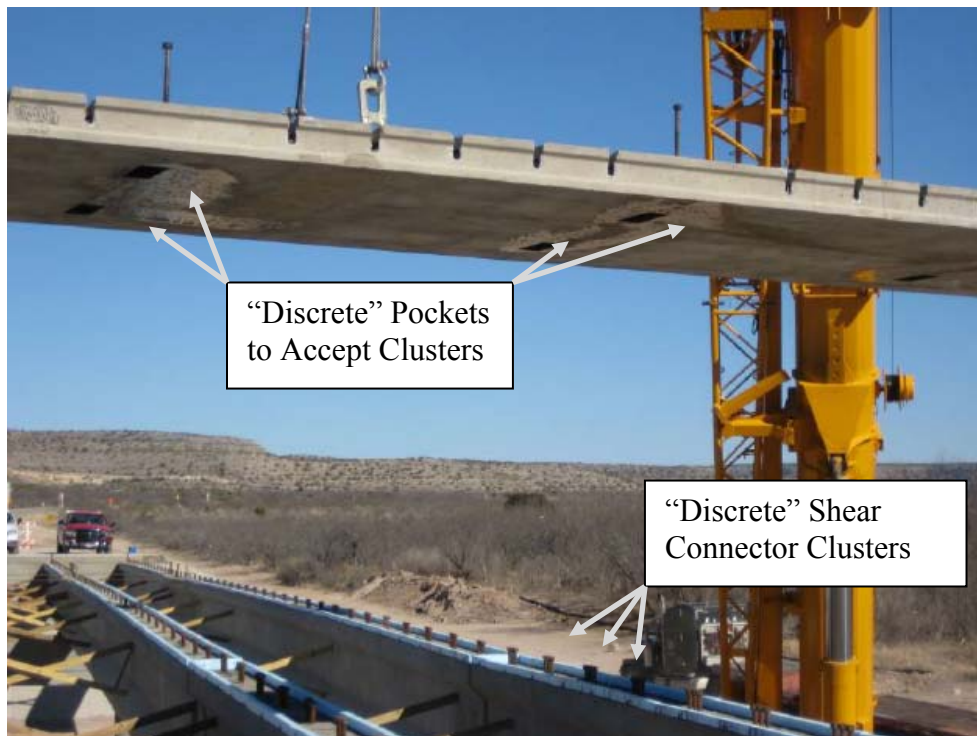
Typical “Discrete” Shear Pocket Longitudinal Joint (Culmo 2011)
